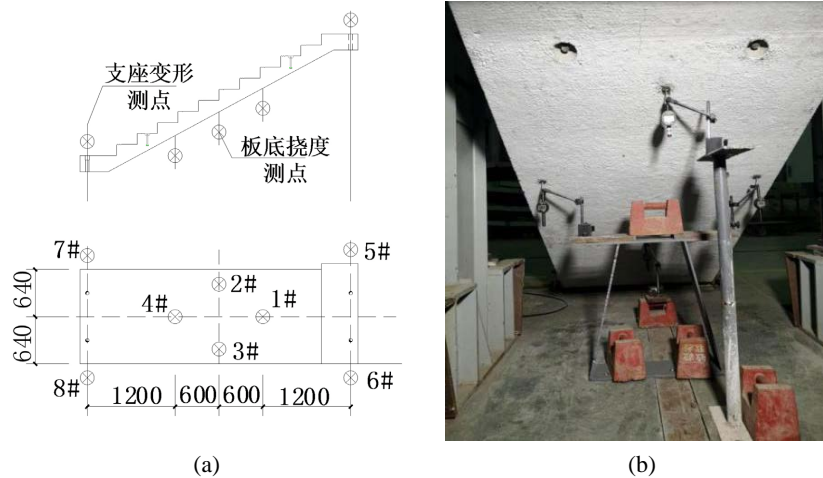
Layout of survey points. (a) Layout of survey points; (b) Installation of displacement meter under the slab
